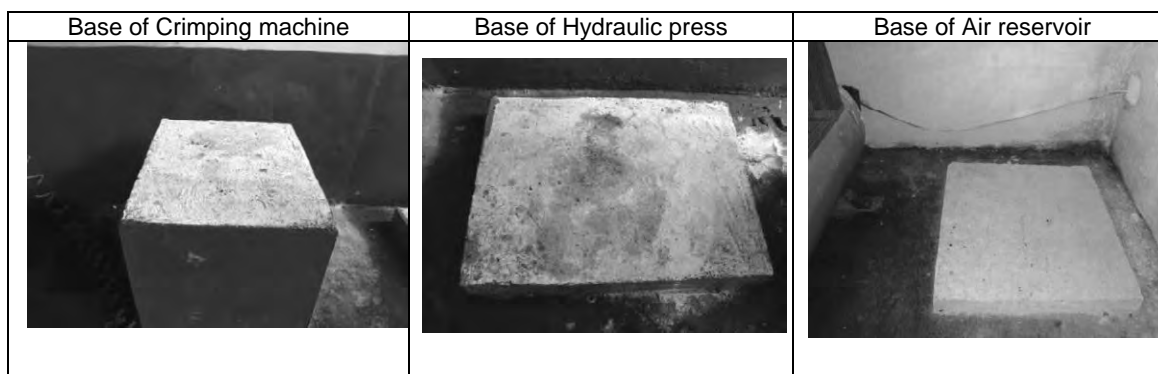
Bases for Crimping Machine, Hydraulic Press, and Air Reservoir
